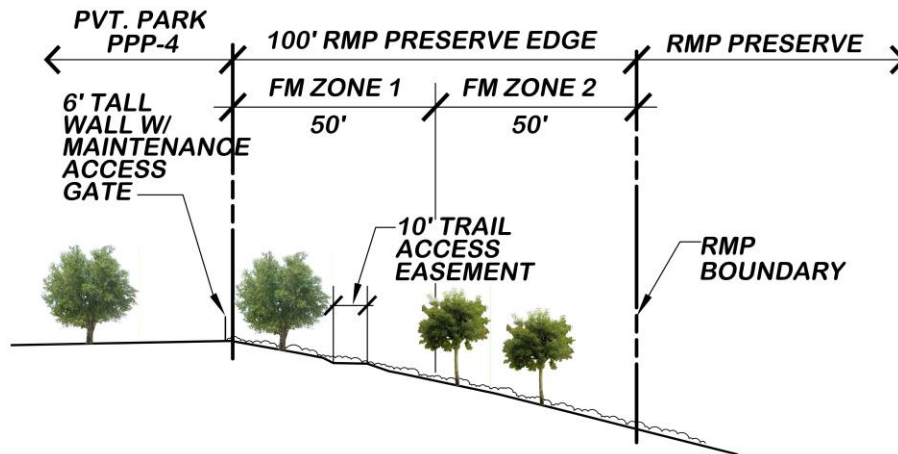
Typical Condition 4 – Easement for Future Trail Access @ PPP-4
